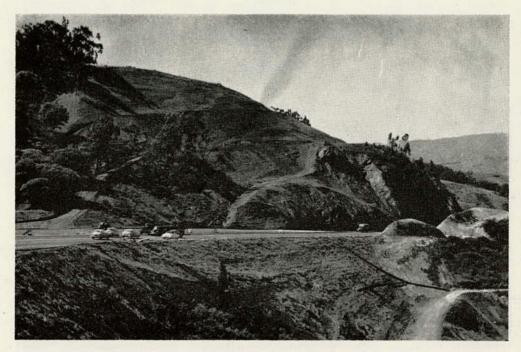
Prevention of landslides by flattening cut slopes near Waldo, Calif. Top of flat cut slope is at skyline in left background. Note bench construction of high embankment in foreground. (Photograph by Bruce Utt, courtesy of California Division of Highways)
